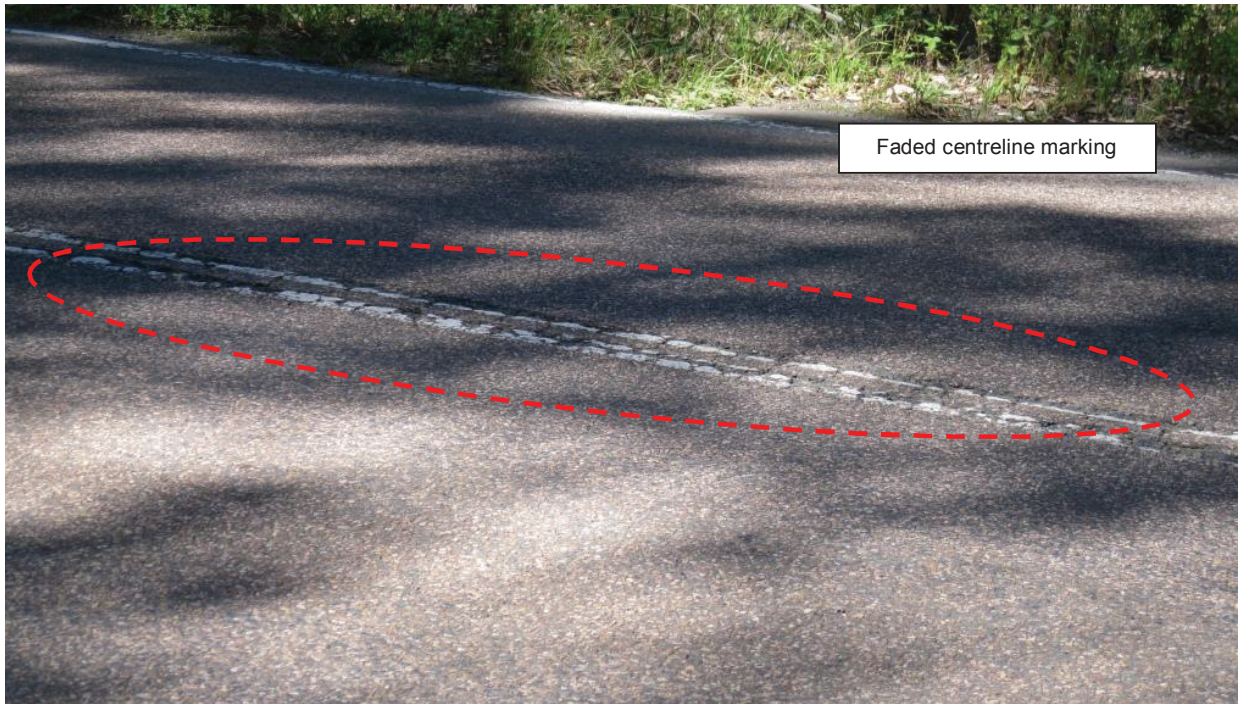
Hue Hue Road, looking north on the road section between Sparks Road and Jilliby Road
